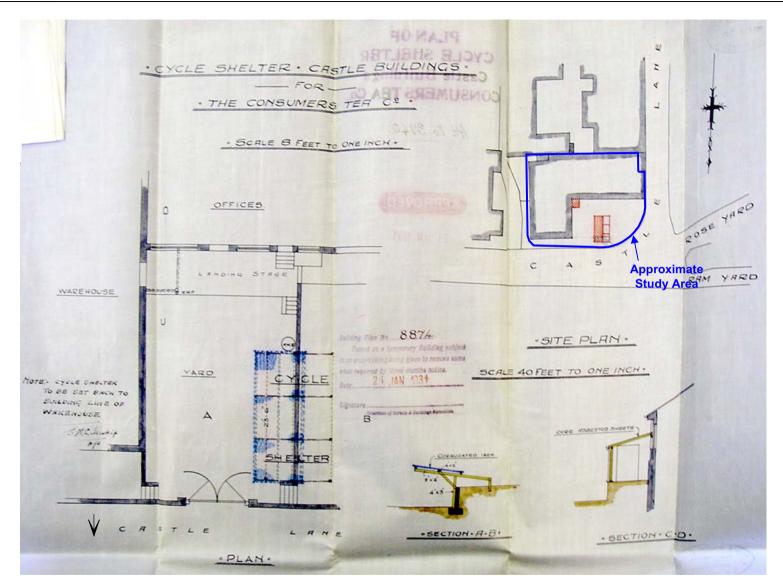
Building plan: cycle shelter, 1931 (Not to scale)
